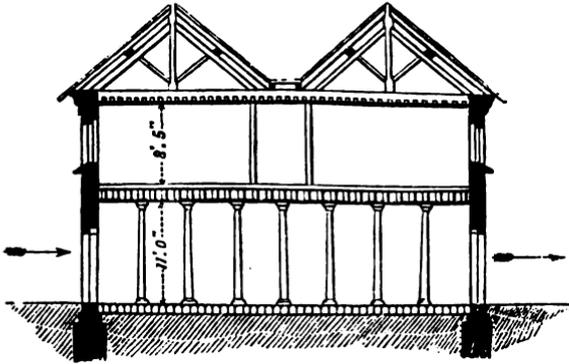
Transverse Section of Stable with living rooms overhead. Eight horses are placed between opposite windows, with their heads to dividing walls. There is only ventilation from each end.
